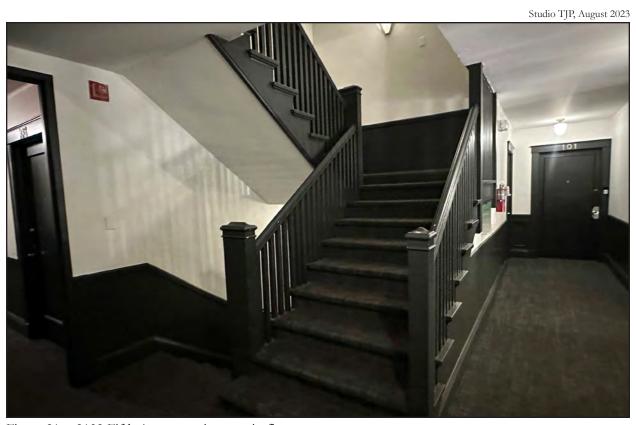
• 2132 Fifth Avenue, stairs at main floor
